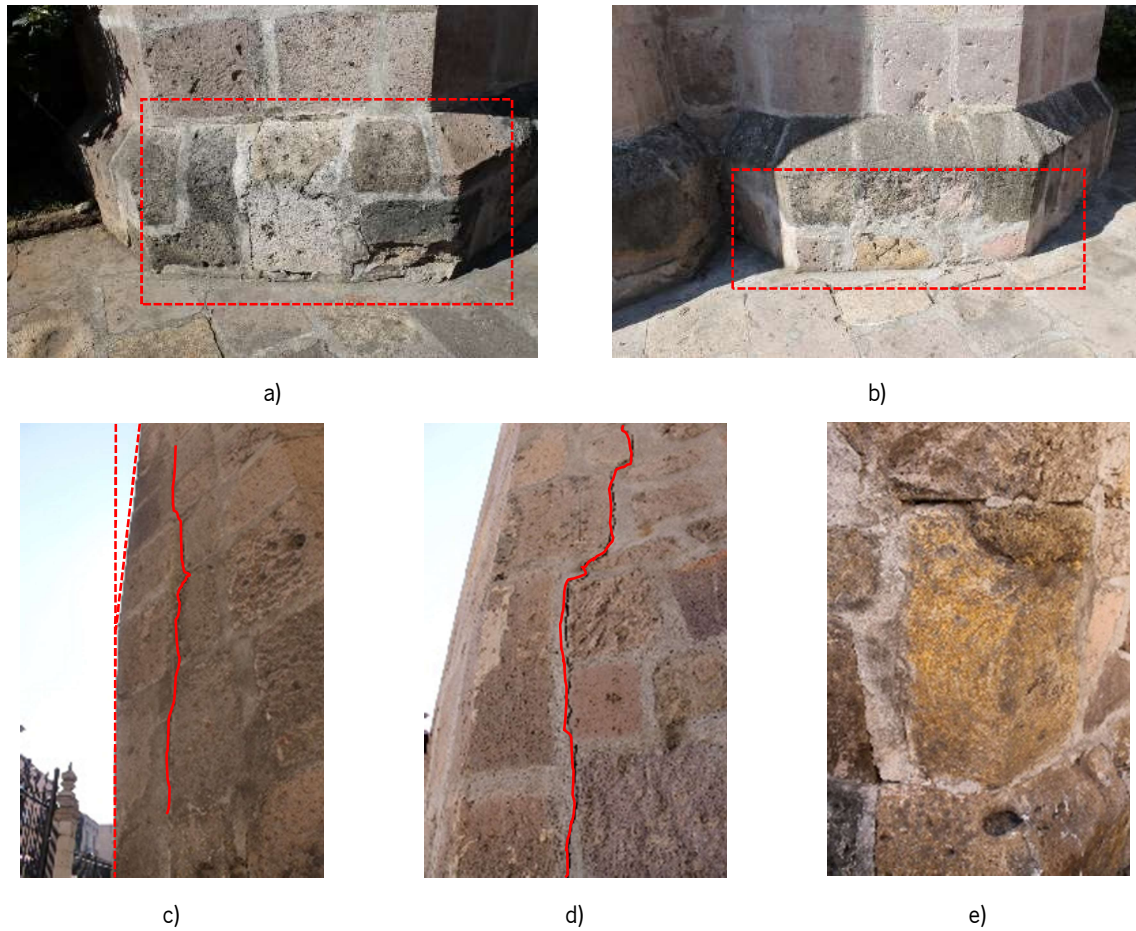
Damage in buttresses: a) and b) detachment of masonry at the basement; c) loss of verticality at the edge and vertical crack; d) vertical crack; and e) replacement of damaged units.
